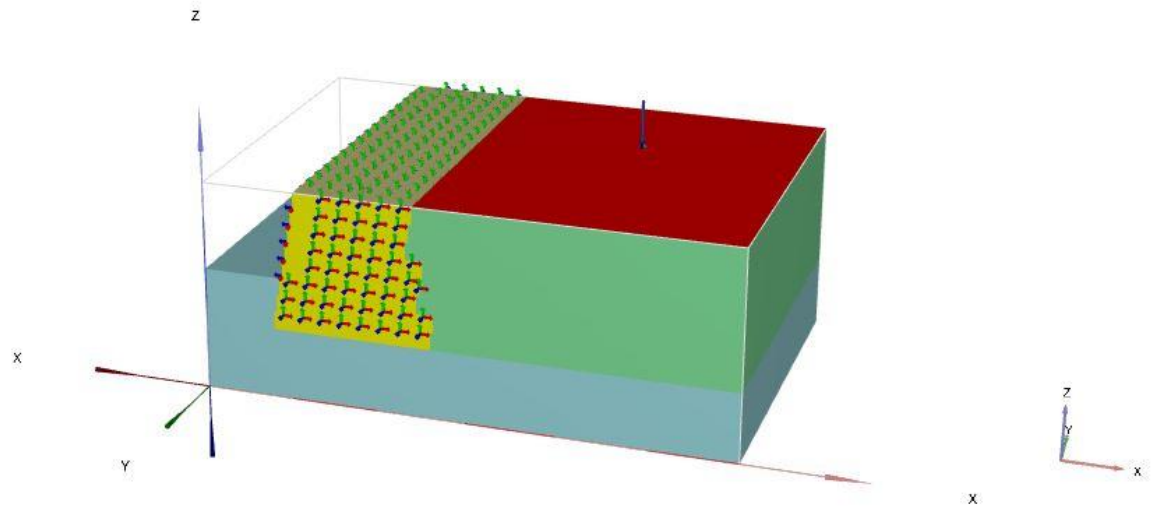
Geocell reinforced retaining wall model inclined with facing angle making 80° with horizontal with surface load generated in PLAXIS 3D
